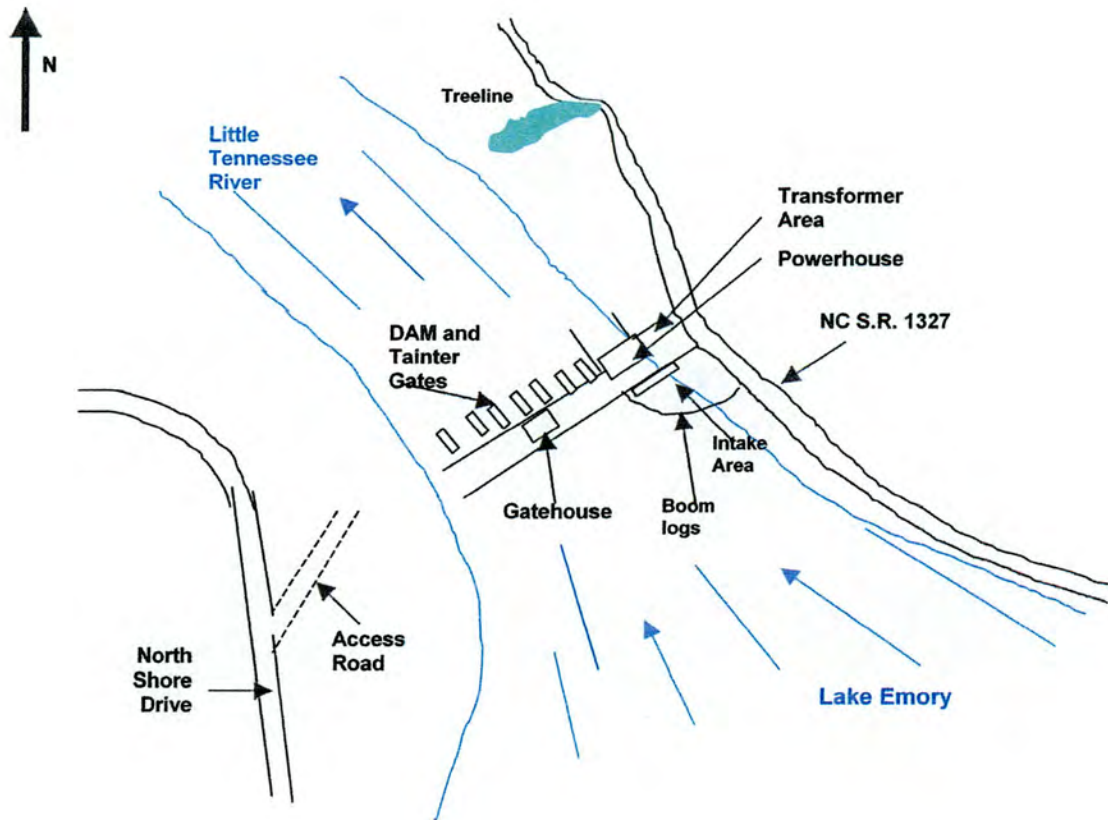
Franklin Dam and Powerhouse Site Plan.
